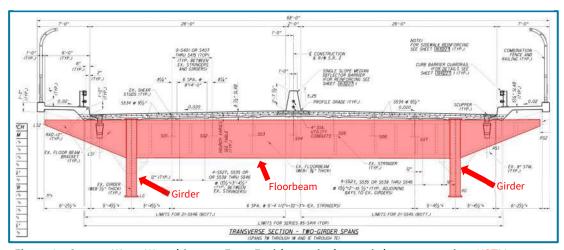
Spans 7W to 1W and Spans 1E to 7E with a typical two-girder cross-section. NSTMs are highlighted in red.
